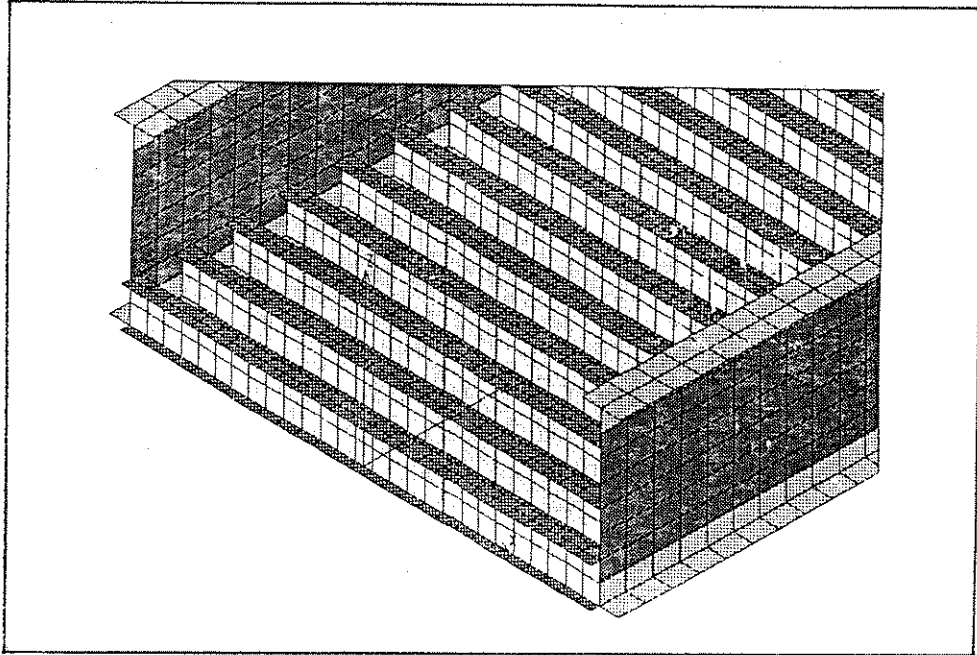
Part of the Model Showing Floor Beams Connected to the Main Girders.
